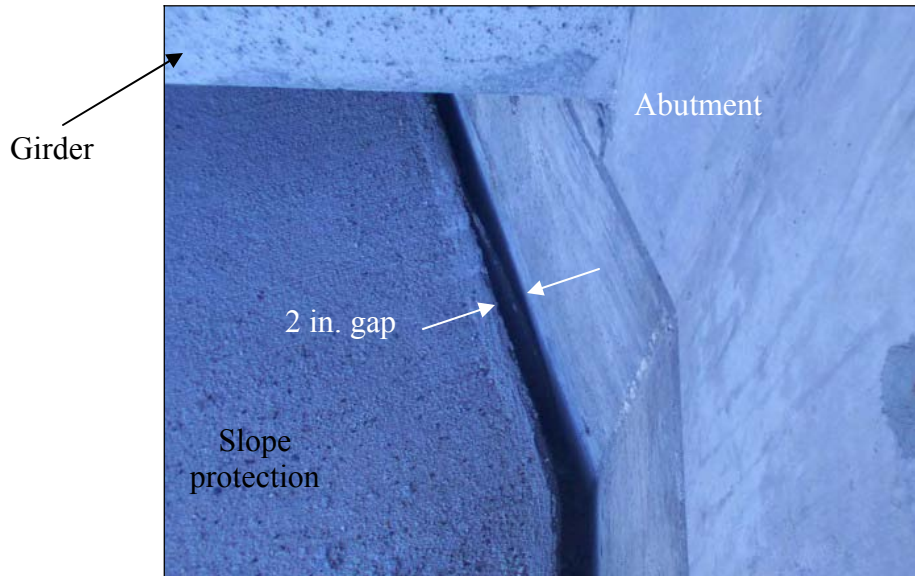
Lateral movement of the abutment away from the bridge embankment caused by expansion of the bridge structure (North end of NBL)
